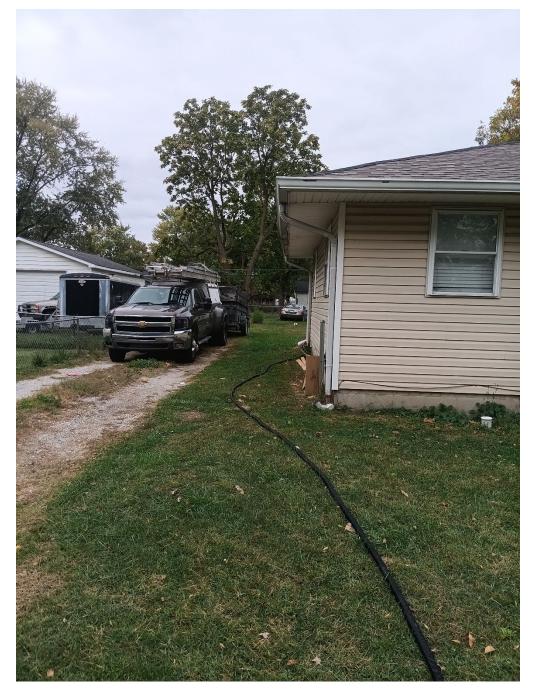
Southside of 1718 Hamblen E Drive, homeowners will be extending to add room to existing bedrooms.
